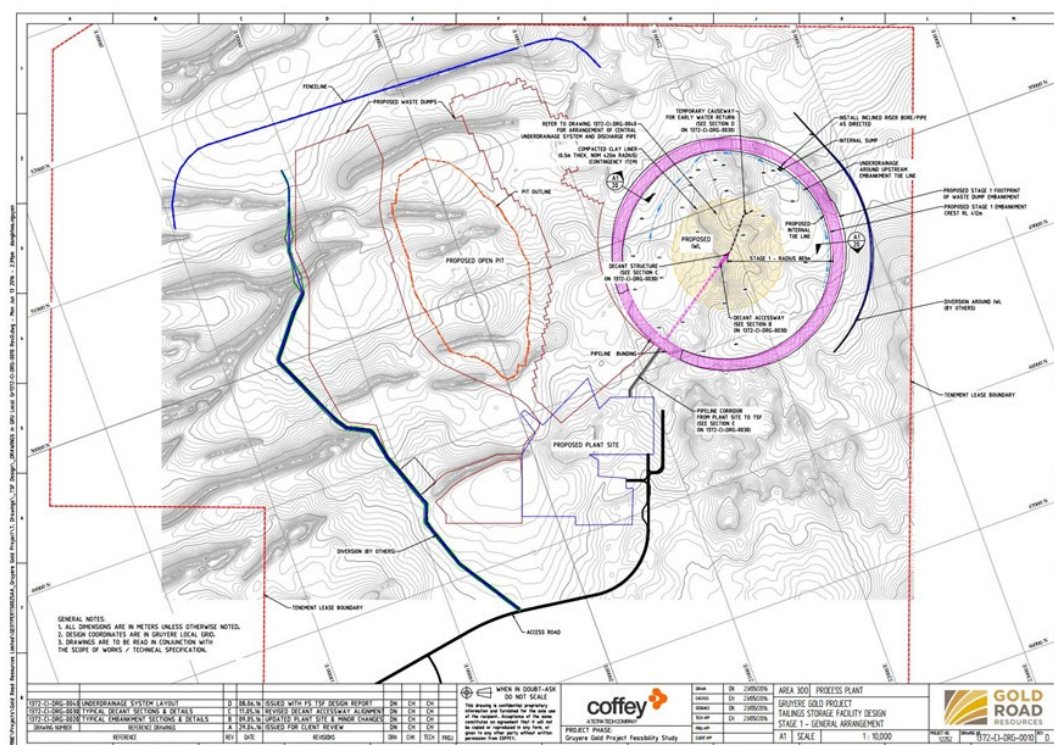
Proposed Location of Stage 1 TSF to north-east of Plant Site and east of Gruyere Open Pit
